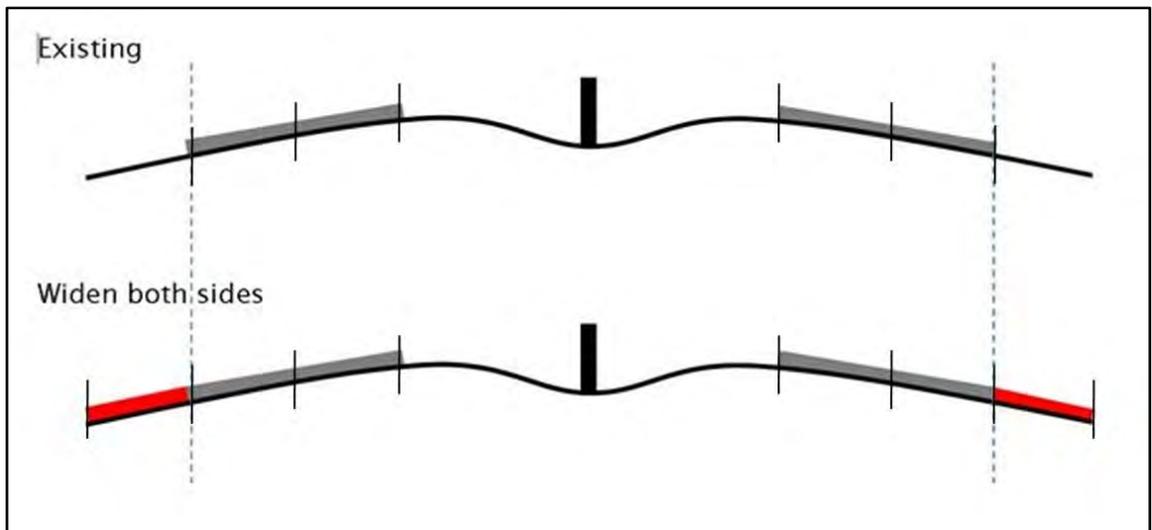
Adding Additional Lanes on Outside of Existing Carriageway
